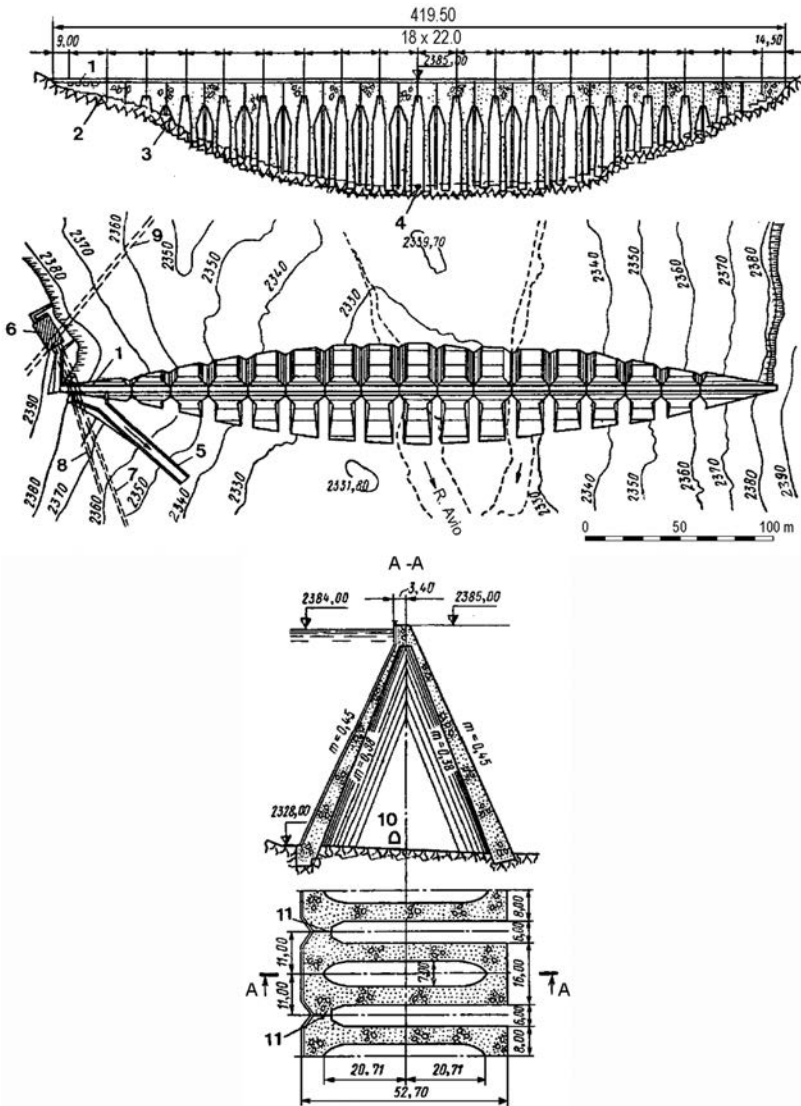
Pantano d'Avio buttress dam, Italy, with twin buttresses. (1) Spillway; (2) top of cutoff wall; (3) bottom of cutoff wall; (4) bottom outlet; (5) chute spillway; (6) office building and manhole; (7) tunnel of the outlet; (8) inclined gallery for communication with the gate chamber; (9) tunnel of the intake; (10) gallery in buttress; (11) joint with sealing (detail in Fig. 19.7).
